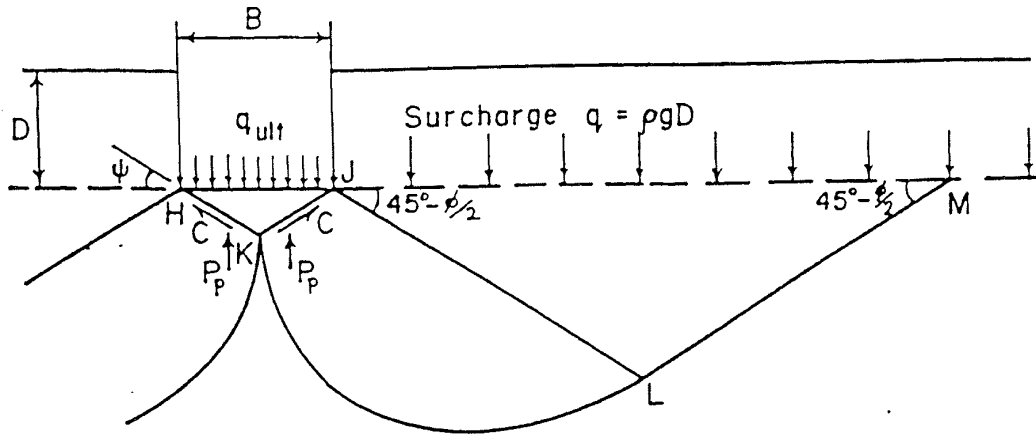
Assumed Mode of Failure for a Strip Footing
